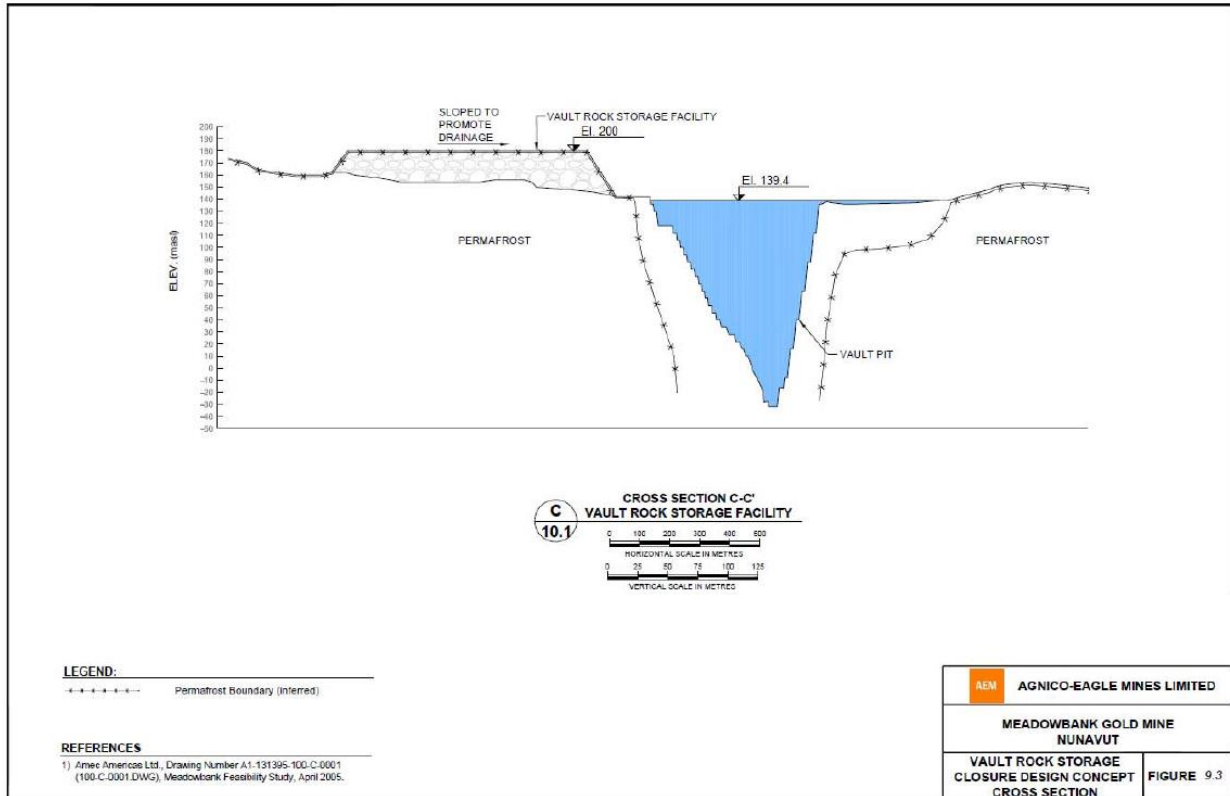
Vault Rock Storage Closure Design Concept Cross Section
